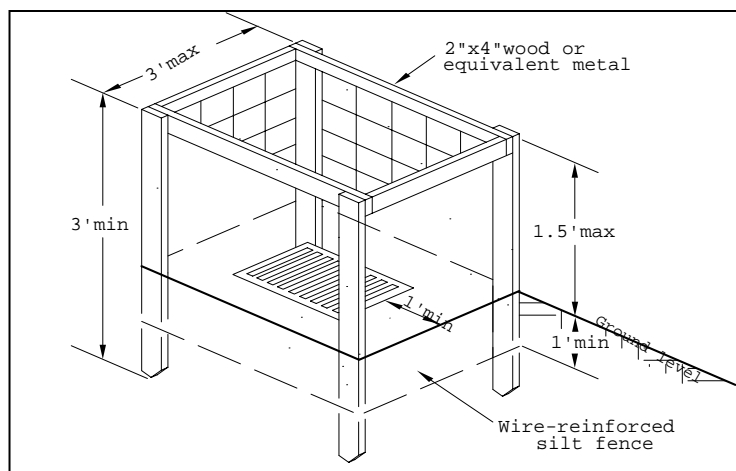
Fabric and Supporting Frame for Inlet protection.
